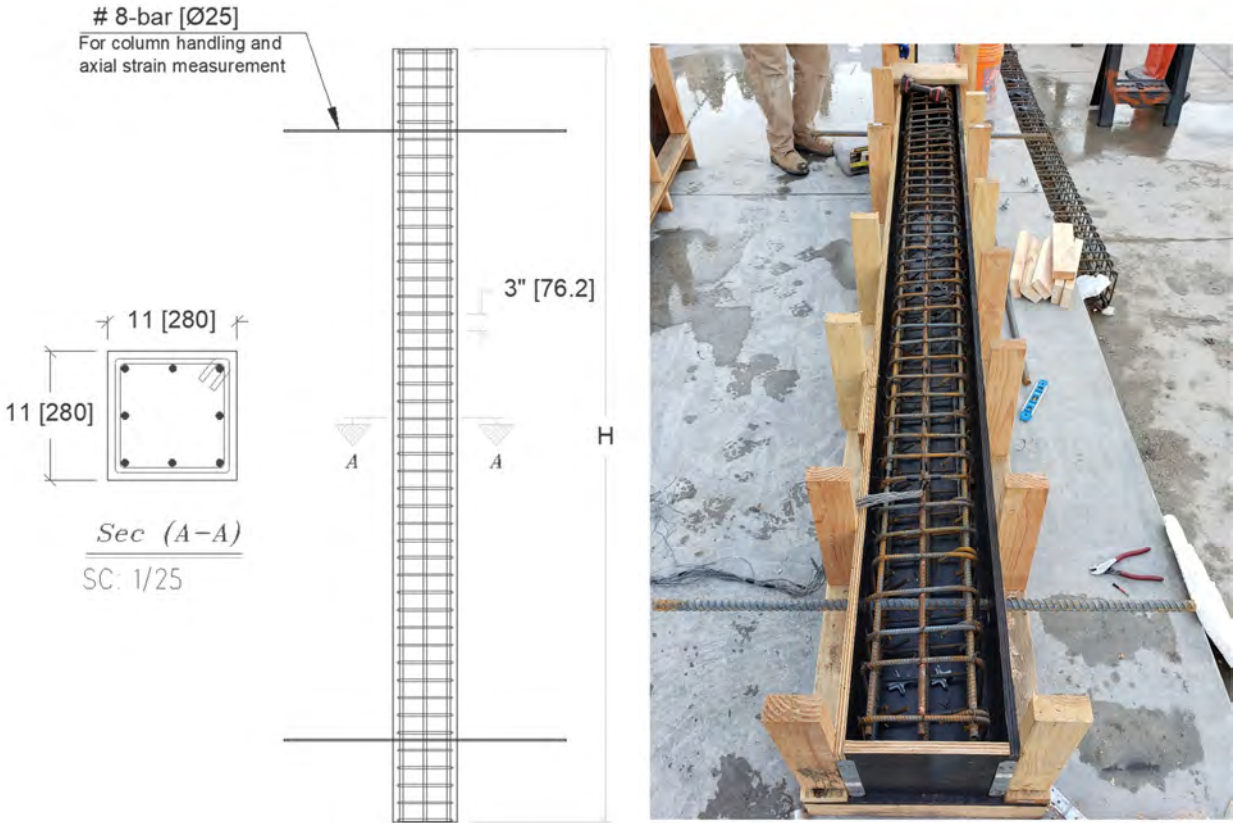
Reinforcement details of a typical UHPC column [dimensions in mm].
